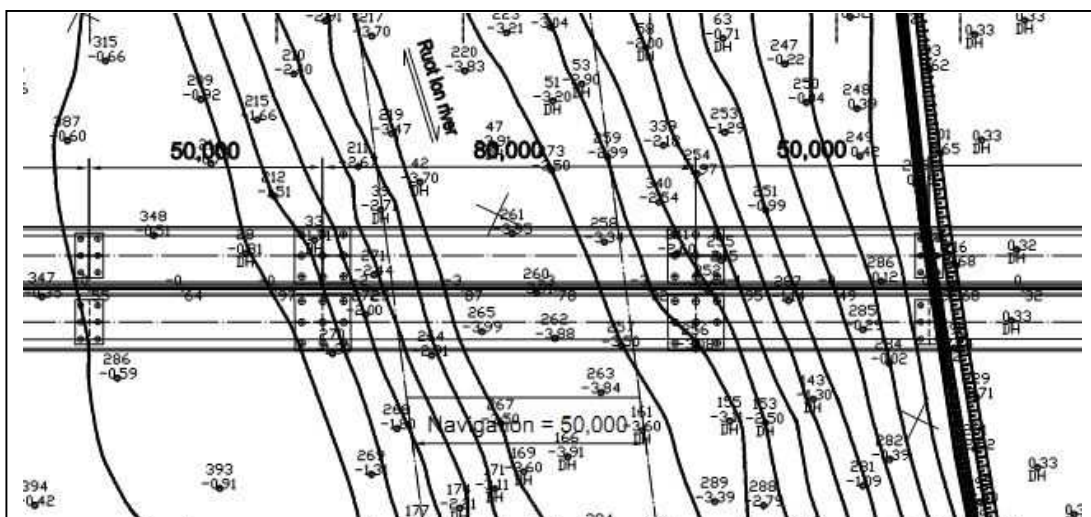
Layout of construction site of piers P6 and P7 on Ruot Lon river
